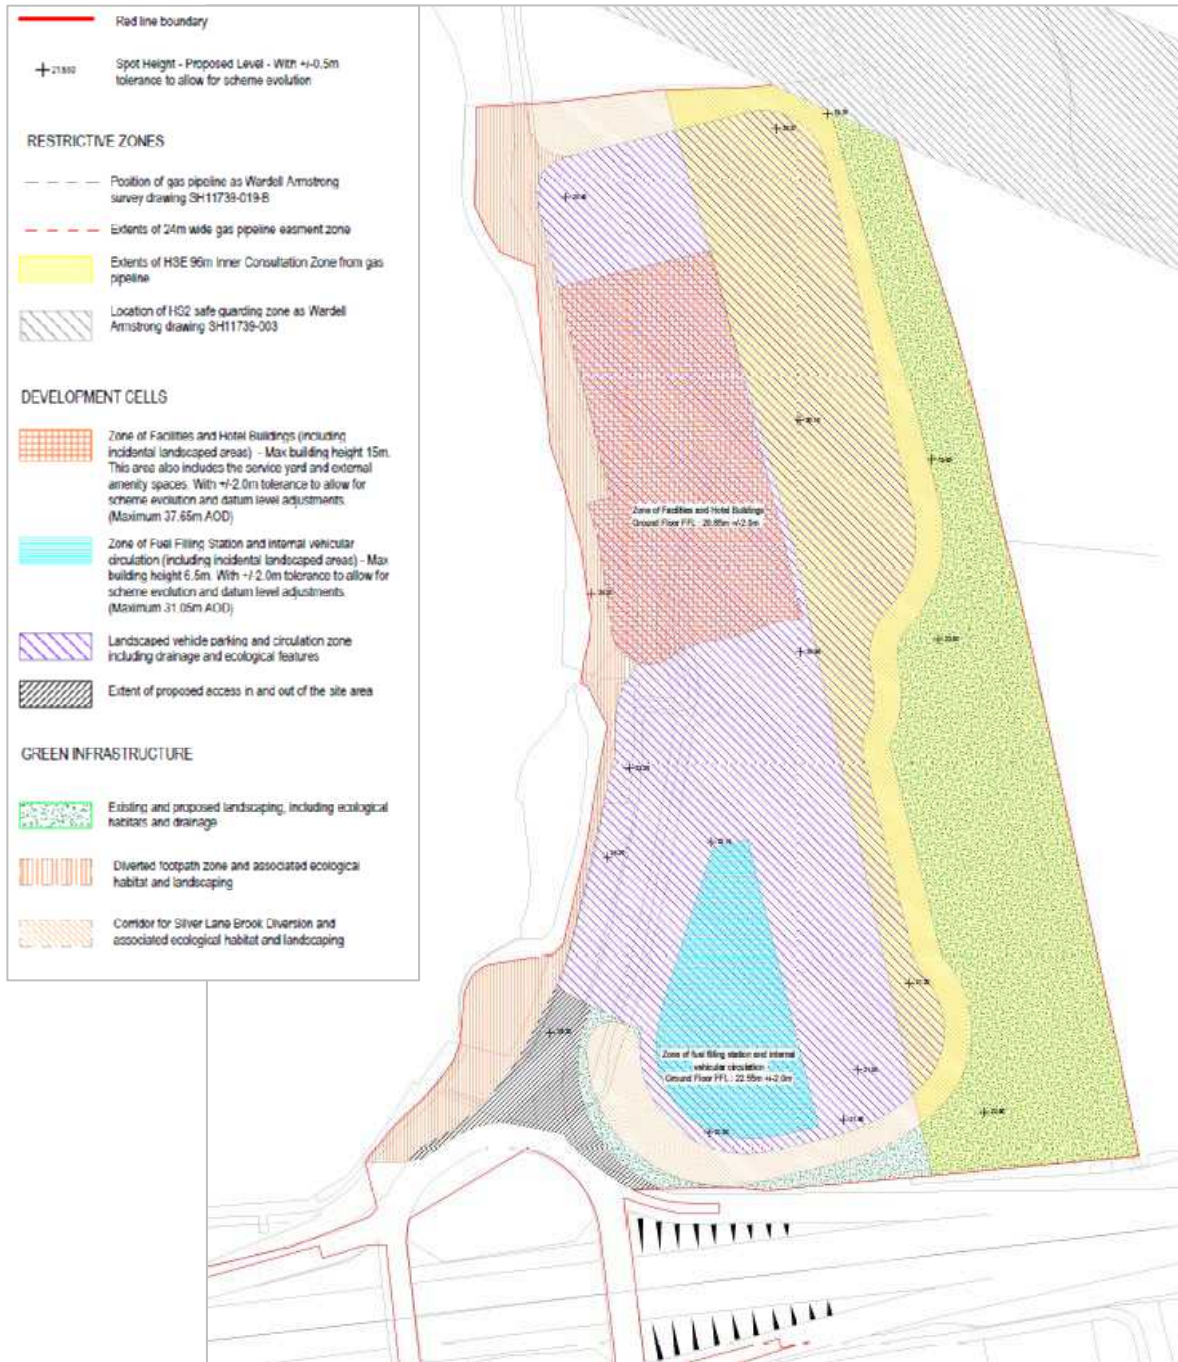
Parameters Plan showing all Parameters combined on a single plan
